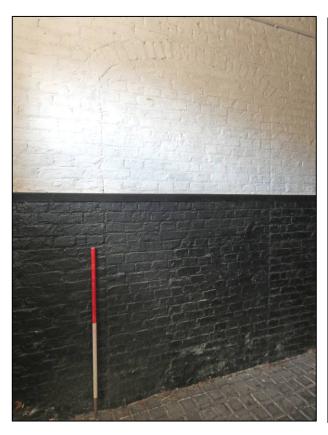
East range, ground floor passage (GF4), blocked opening to north wall, looking N (photo 1/732).
